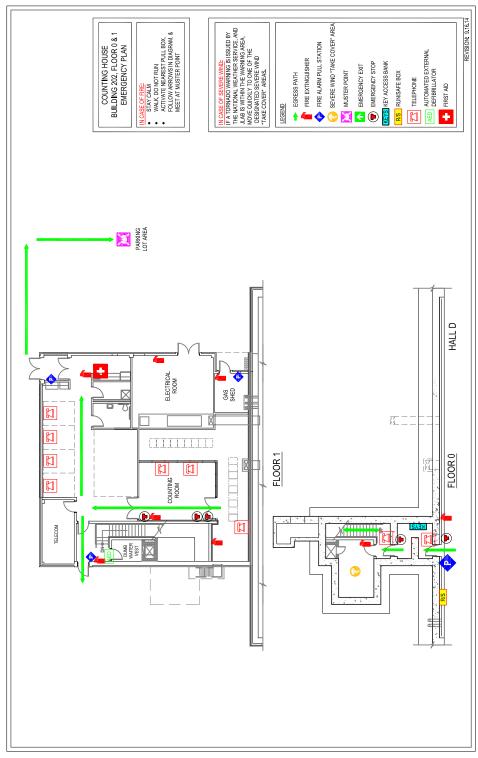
Layout of the Hall D experimental hall indicating safety equipment and emergency plan.
